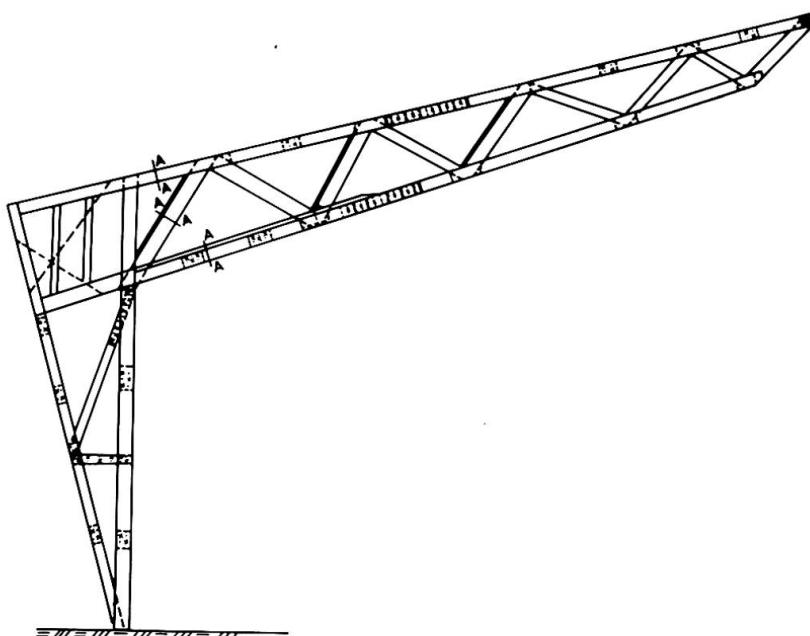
One half of a three-hinged truss frame, spanning 15.5 m, with joints at A-A.
